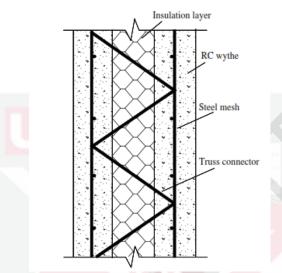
Section through Precast Concrete Sandwich Panel (Hamed, 2016)
